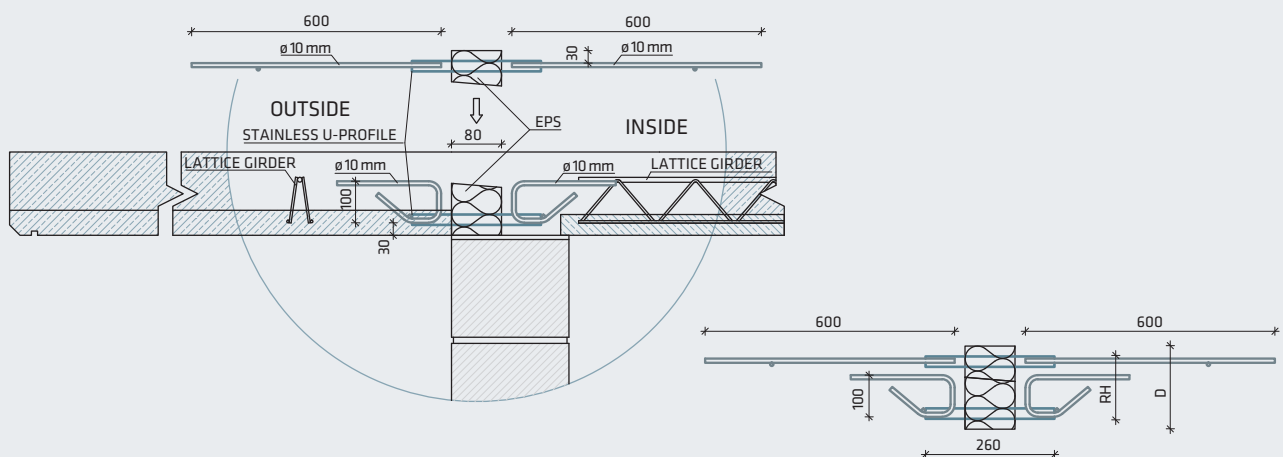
Cantilevered balcony slab with split TKF E-E rib
